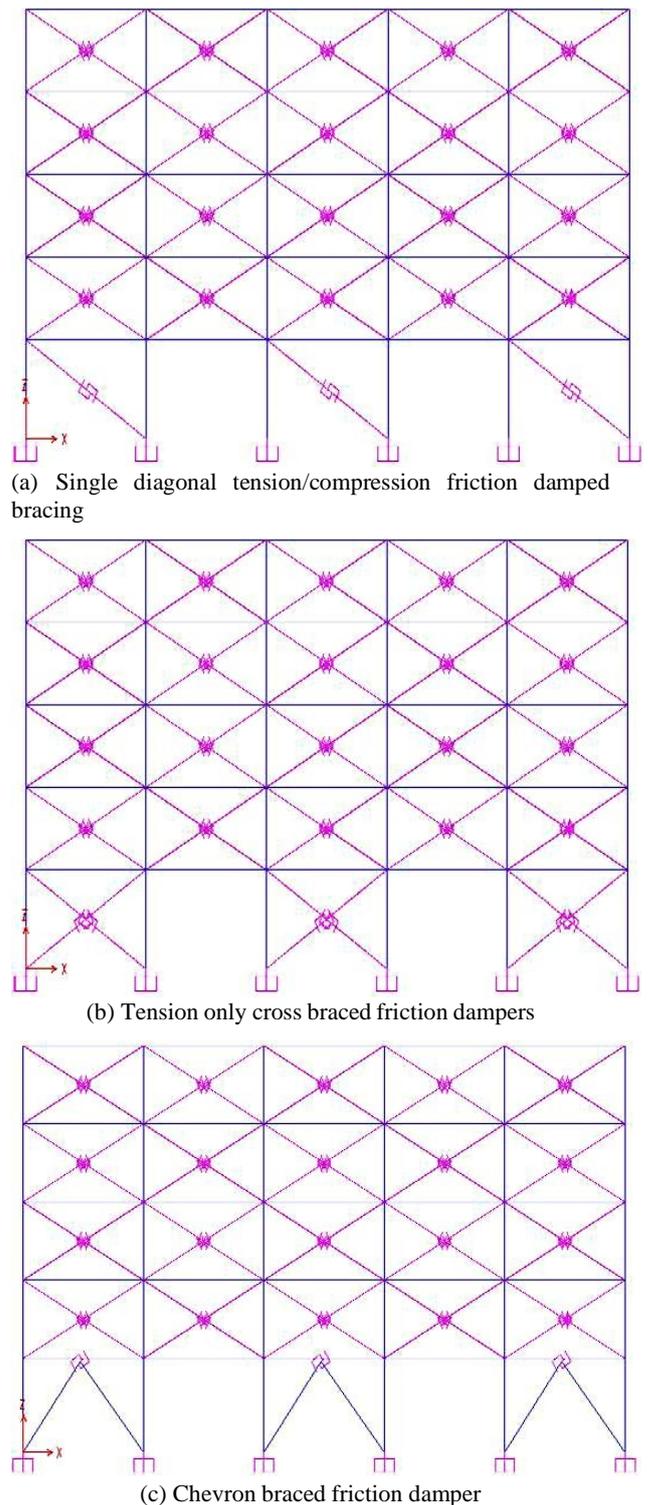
Elevation of G + G open ground storey buildings strengthened with different types of friction dampers as modeled in SAP2000.
